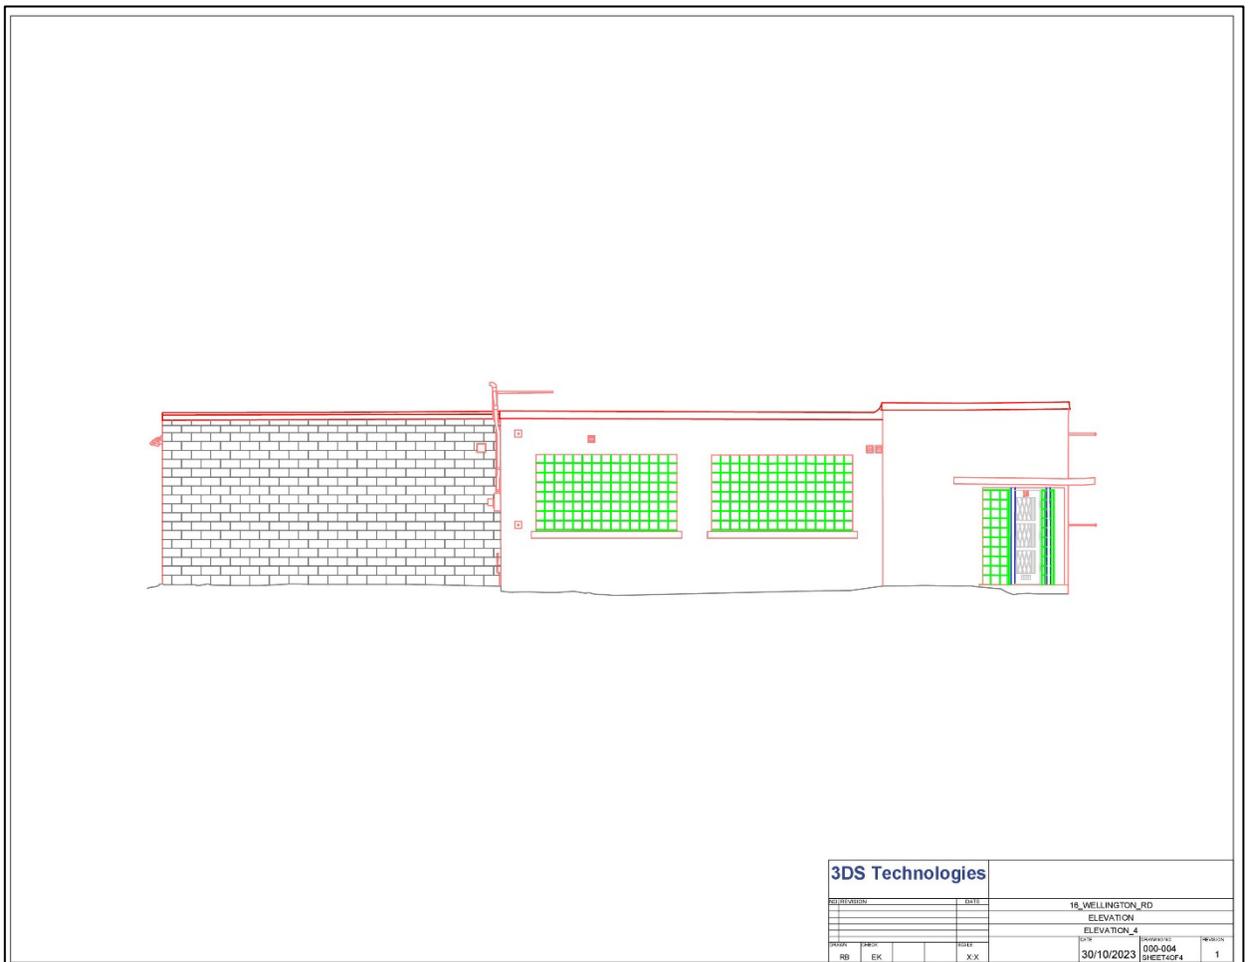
West elevation of the building at 16 Wellington Road (3DS Technologies, dated October 30, 2023).
